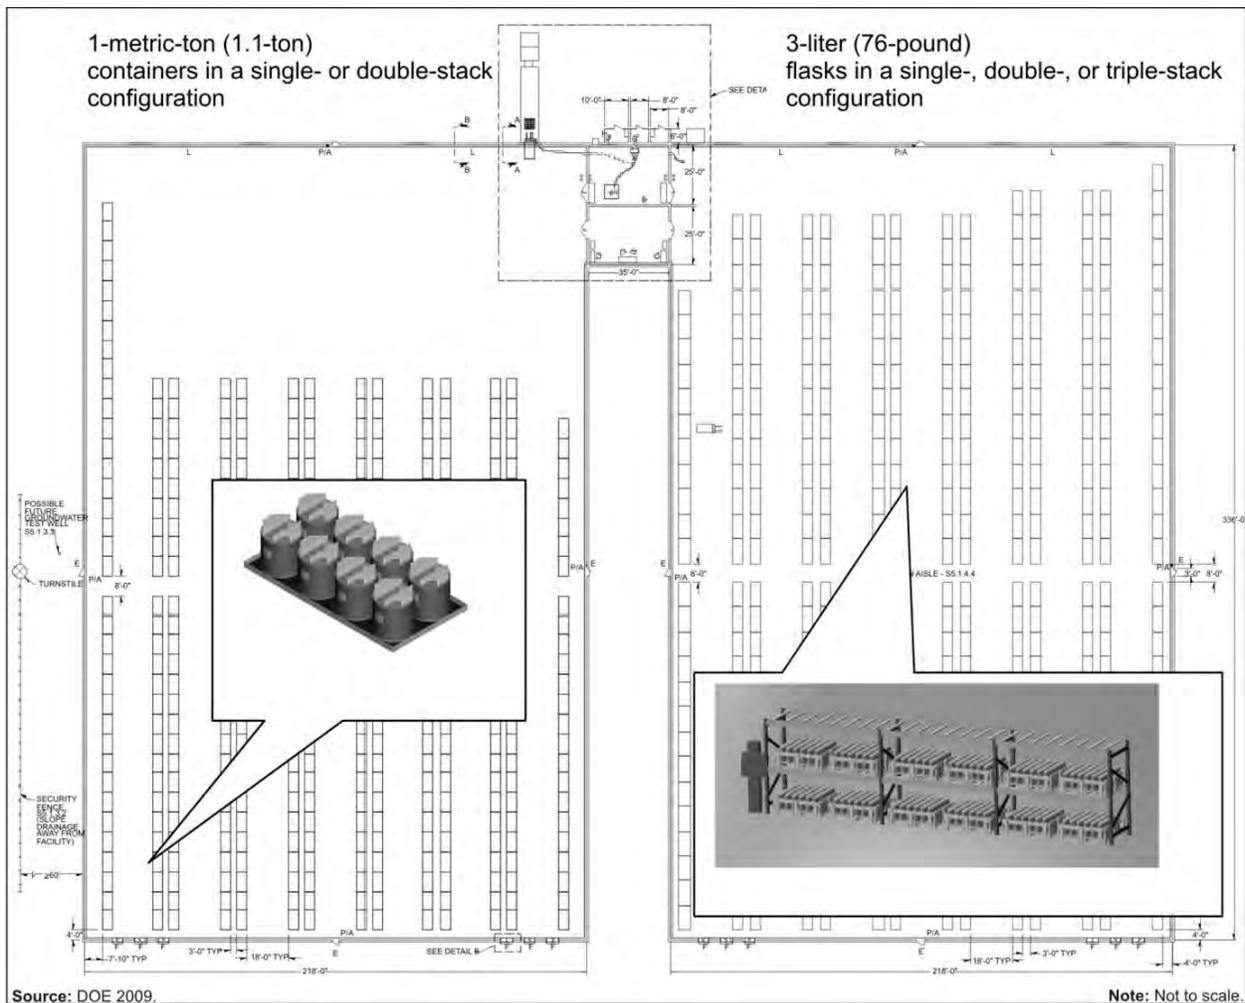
Conceptual Layout for a New Mercury Storage Facility
